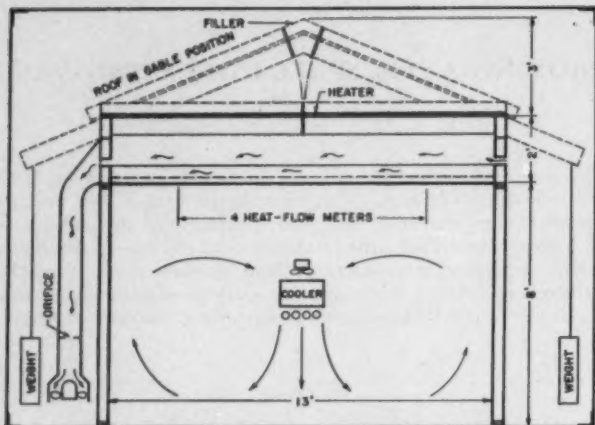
TEST HOUSE IN CONTROLLED ROOM
